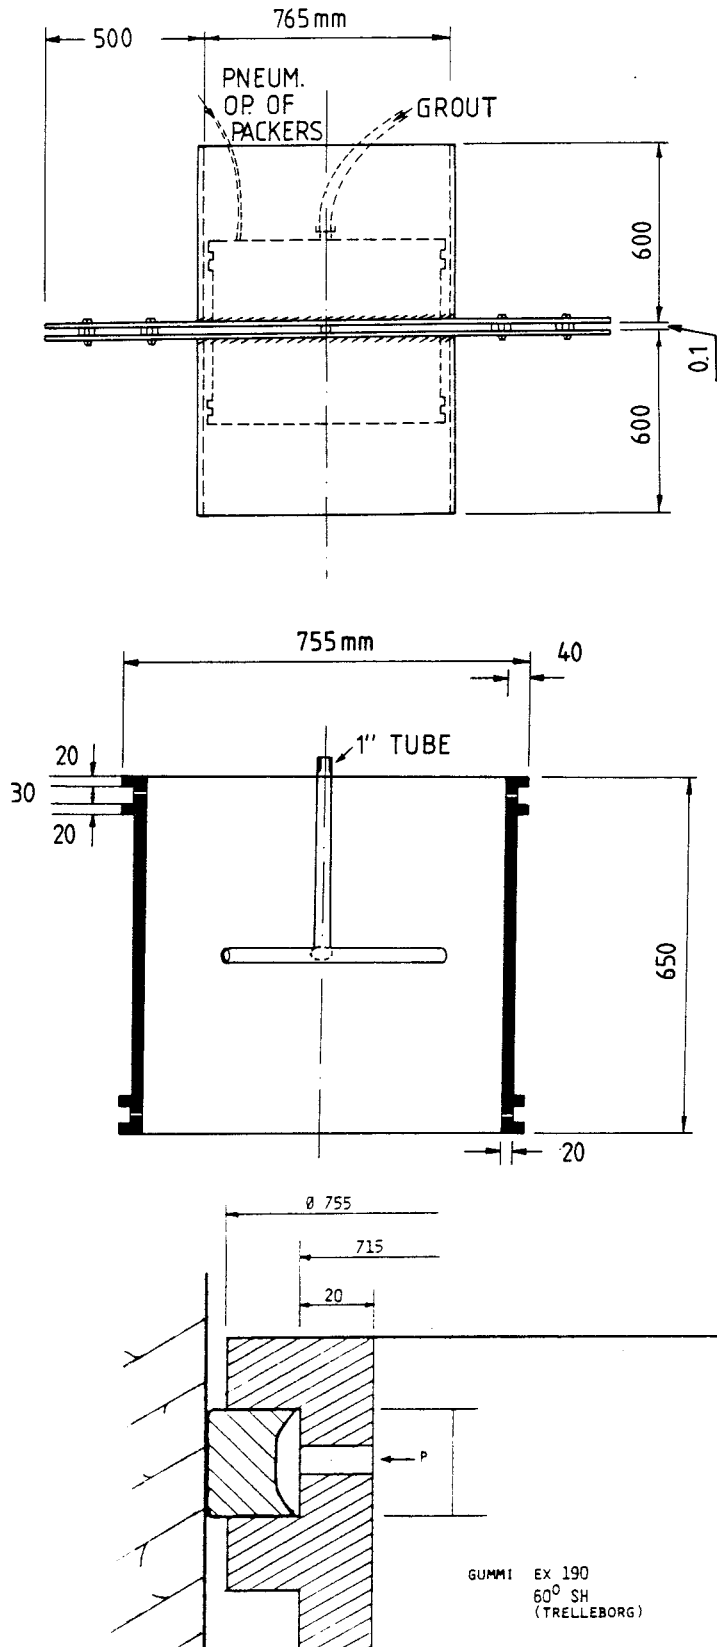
Equipment for pilot injection test in simulated deposition hole. Upper picture shows steel tubes representing the borehole while the lower picture shows the packer and detail of rubber sealing
